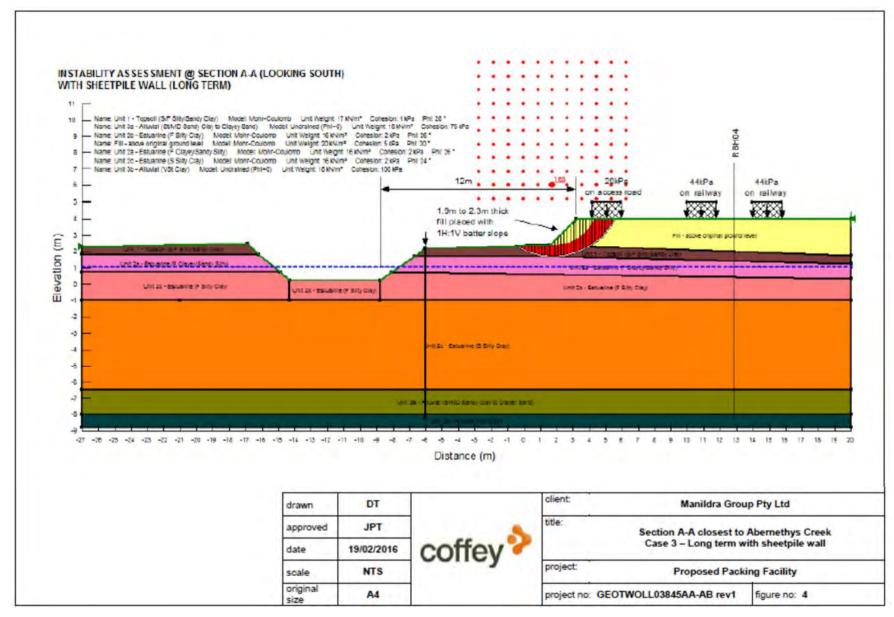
Case 3 – Long term with sheetpile wall (extract Figure 4 – Coffey's Geotechnical Assessment)
